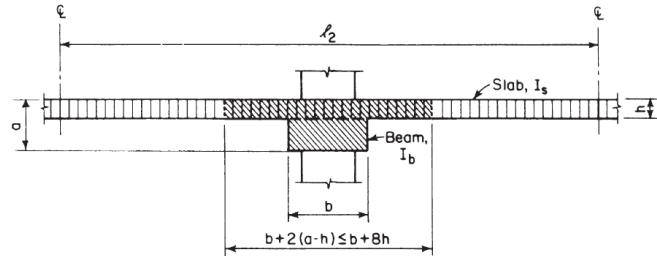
Effective Beam and Slab Sections (Interior Beam)
